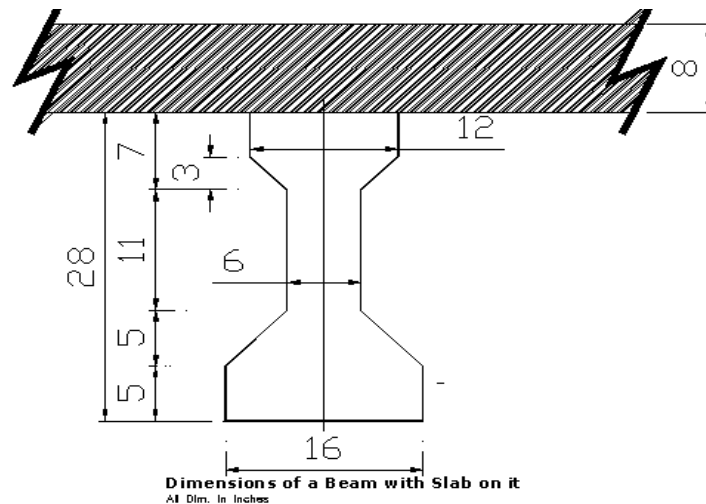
Details of PSFC TxDOT Type-A Beam and Overlaying Slab
